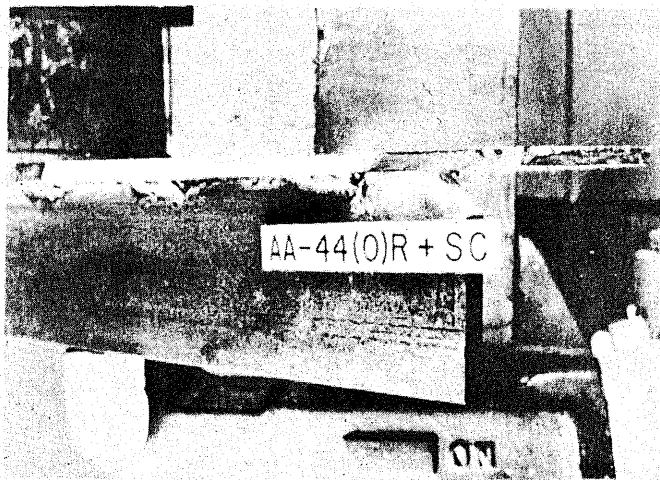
TYPICAL FATIGUE FRACTURES OF STIFFENER SPECIMENS
